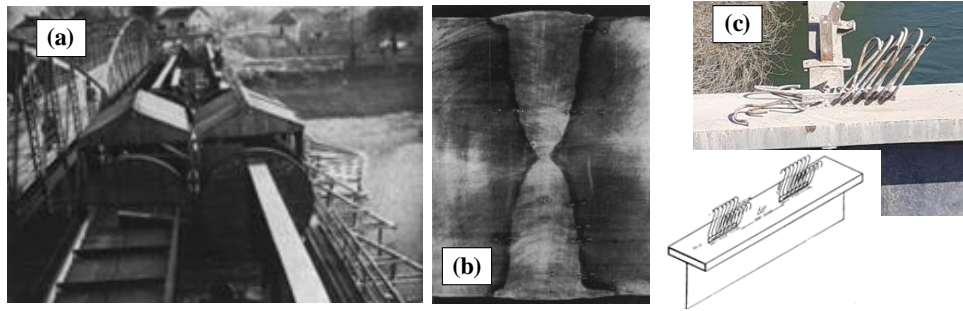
Details from the building process [11]. (a) welding technology, (b) weld quality control, (c) technical detail of the shear connector between the main girder and a concrete slab
